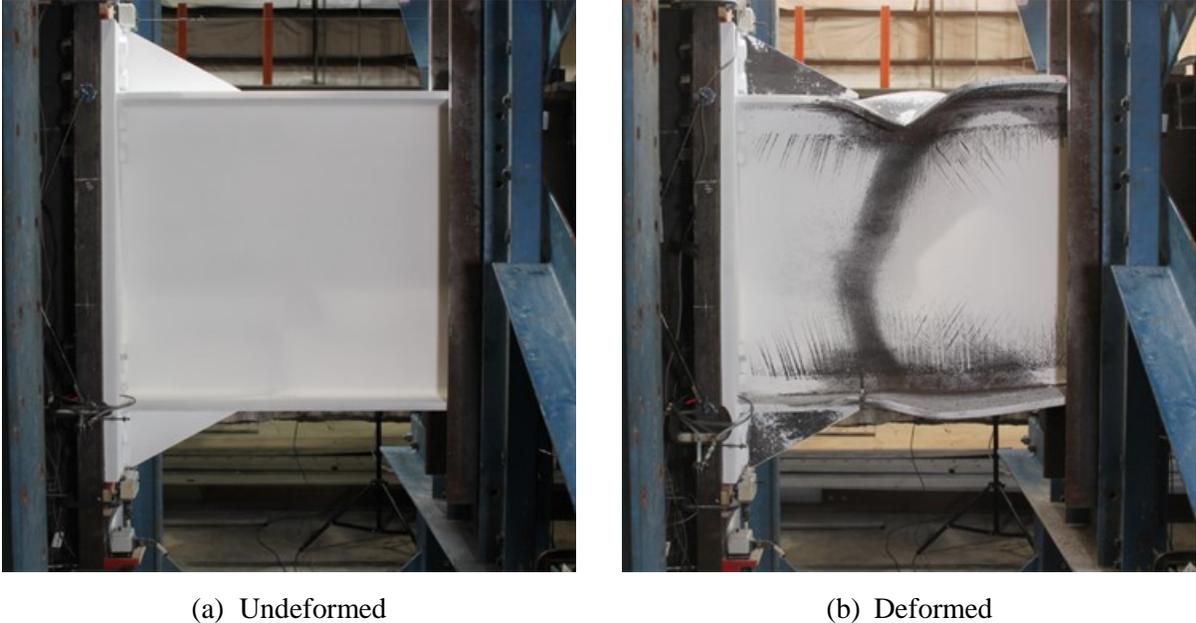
Undeformed and deformed conditions of 8ES-1.375-1.5-36wrap
